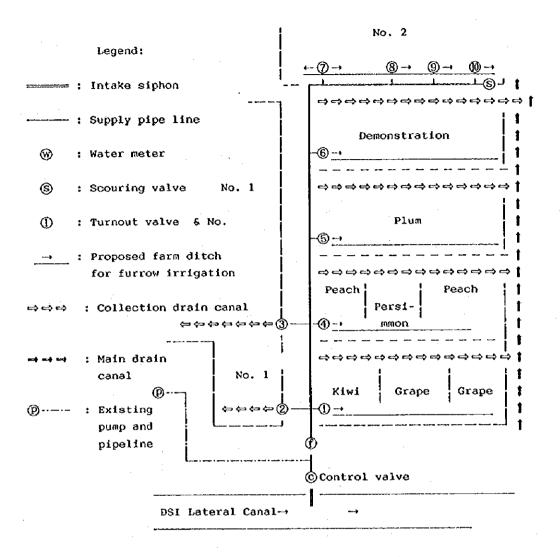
Schematic plan of surface irrigation system for orchard, No.1 and No.2 areas
